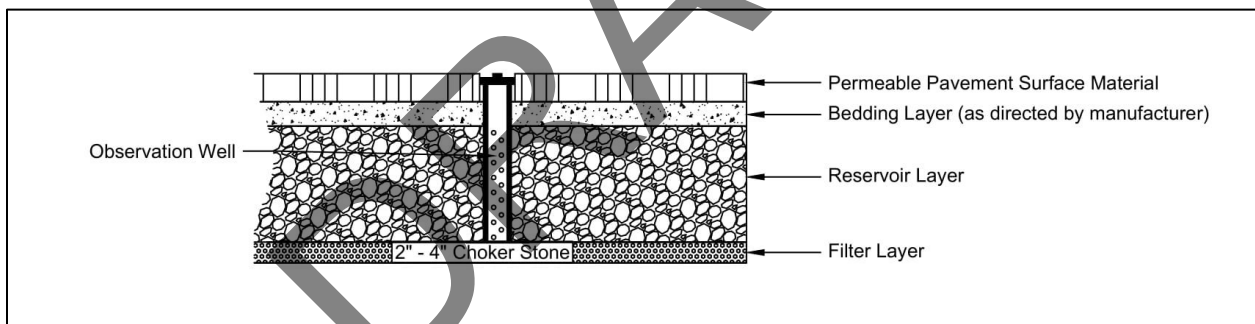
Cross section of an enhanced standard permeable pavement design without an underdrain.
